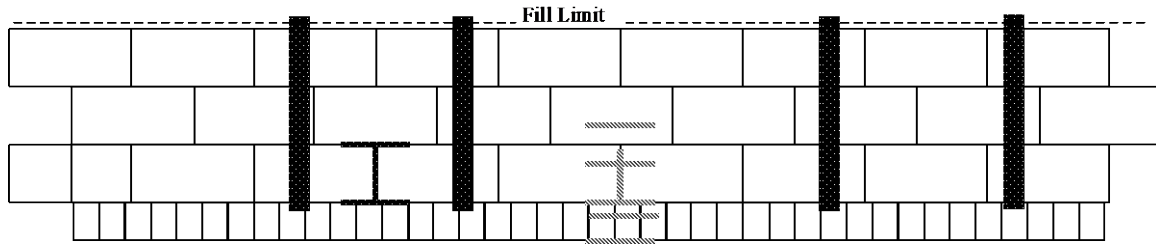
Unwrapped Surface of a Typical Type III Waste Tank, Illustrating TSIP Inspection Requirements (---) and Planned Inspection Extent (—).
